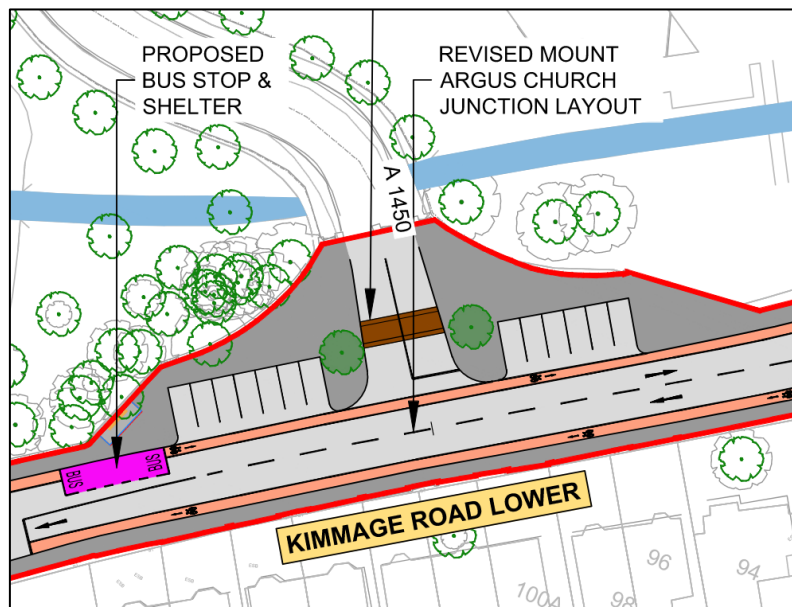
Proposed Junction Layout at Mount Argus Church
